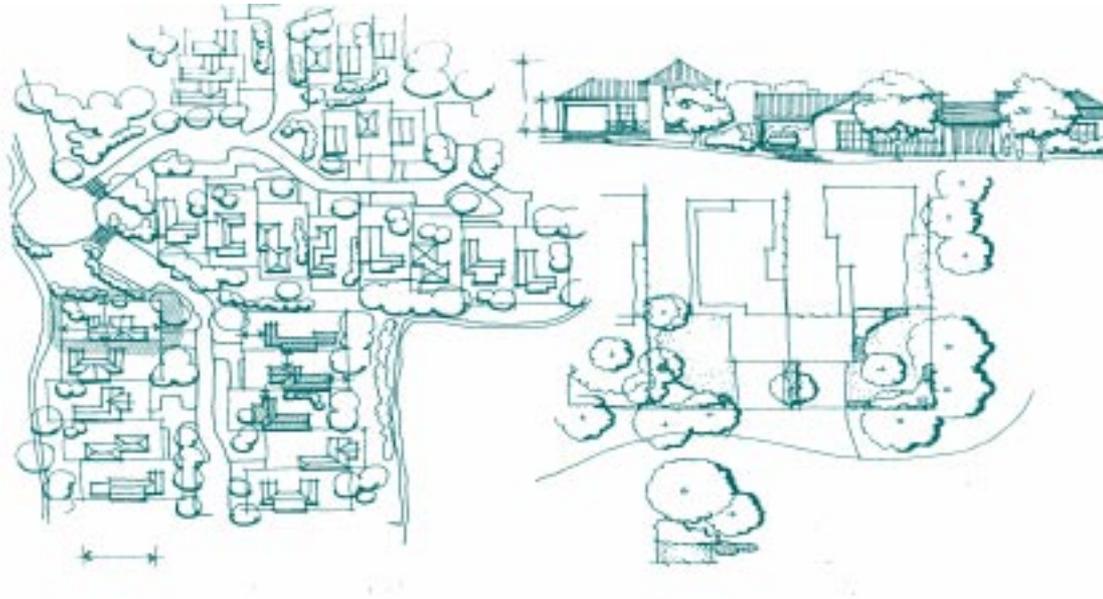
Site plan, building envelope plan and typical streetscape evaluation for an integrated housing project.
